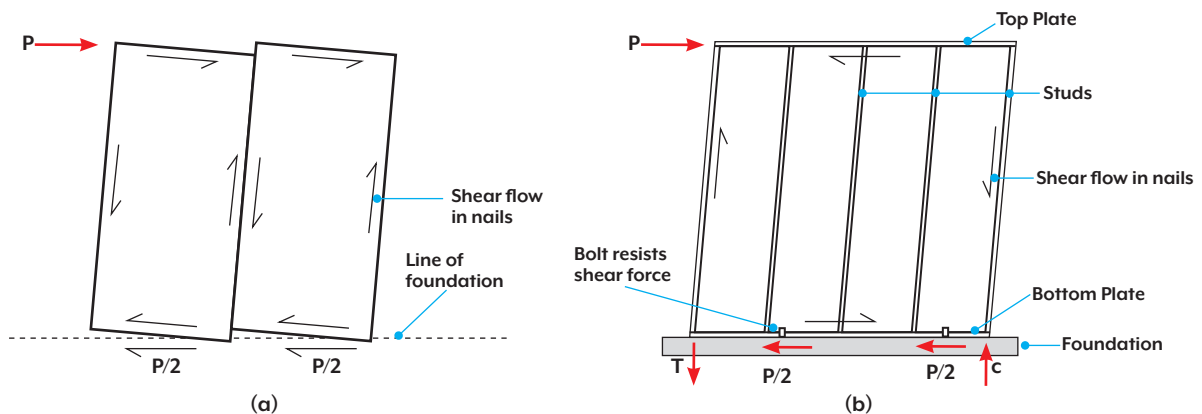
Deformation and forces in (a) the sheathing and (b) the framing under lateral loads.
